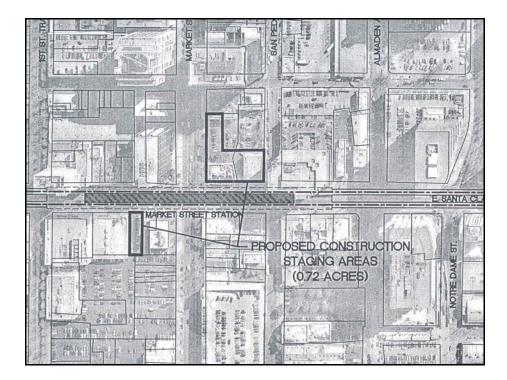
Construction Staging Sites in Southwest and Northeast Quadrants of East Santa Clara and Market Street Intersection
